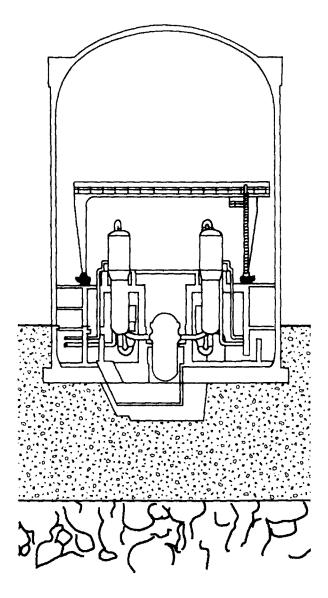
Schematic cross section of the containment building at Zion, showing the approximate extent of embedment.
